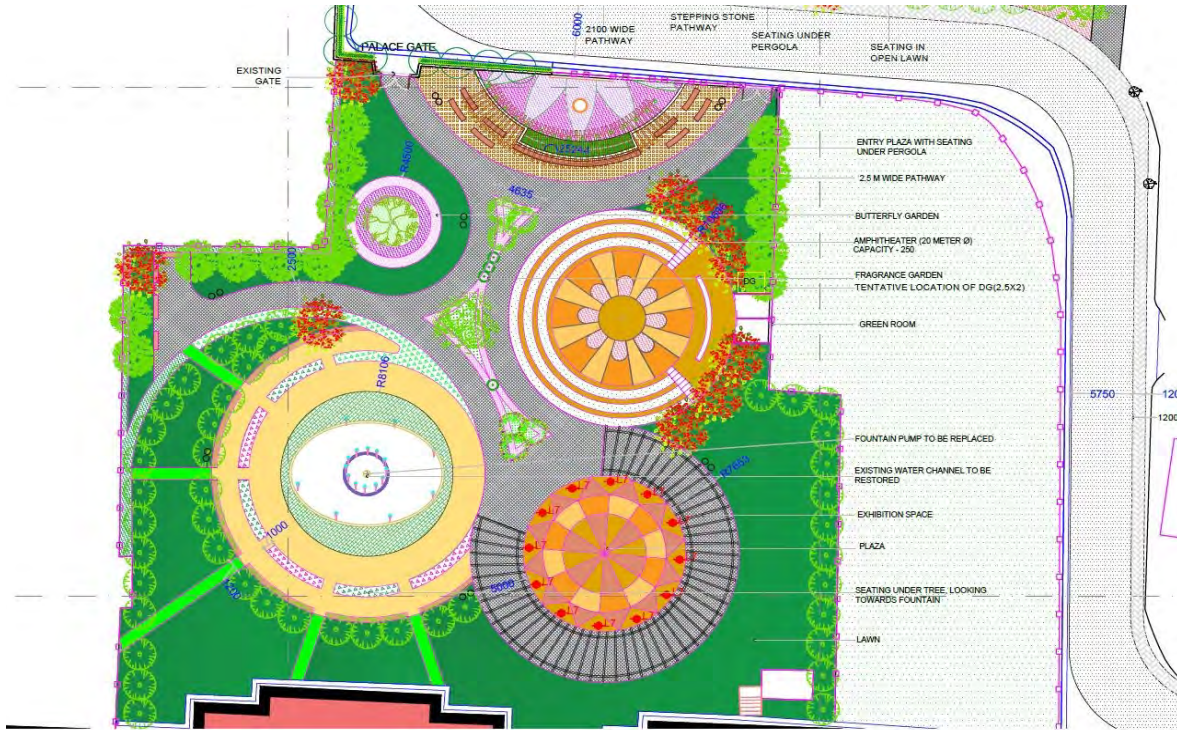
Proposed Revival of Rear garden (Aerial View, Layout and Trees)
